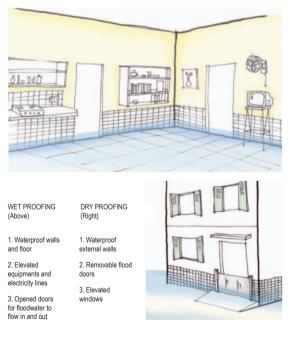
Wet flood proofing and dry flood proofing buildings
